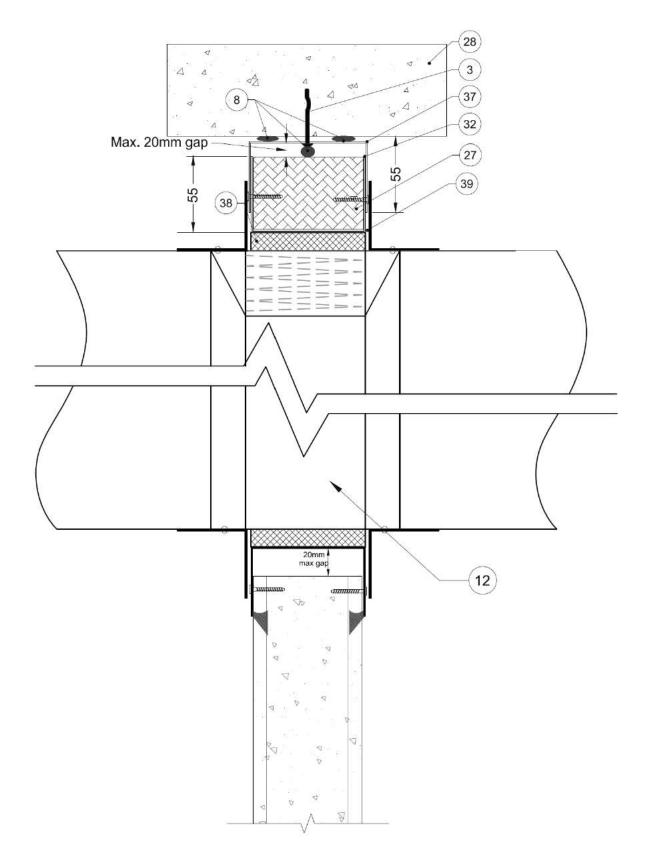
Holyoake IBD-FS and IBD Damper installation 55mm-75mm from top or side
